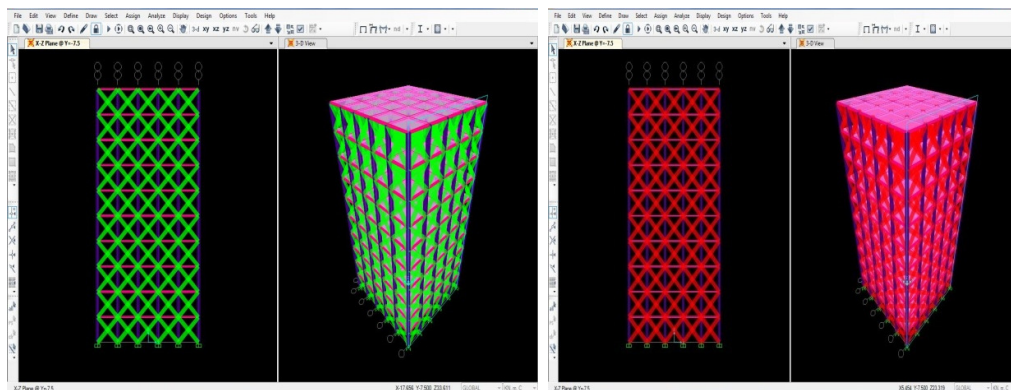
Elevation, 3D view of AAC block and Brick equivalent strut fully infilledSteel building.
